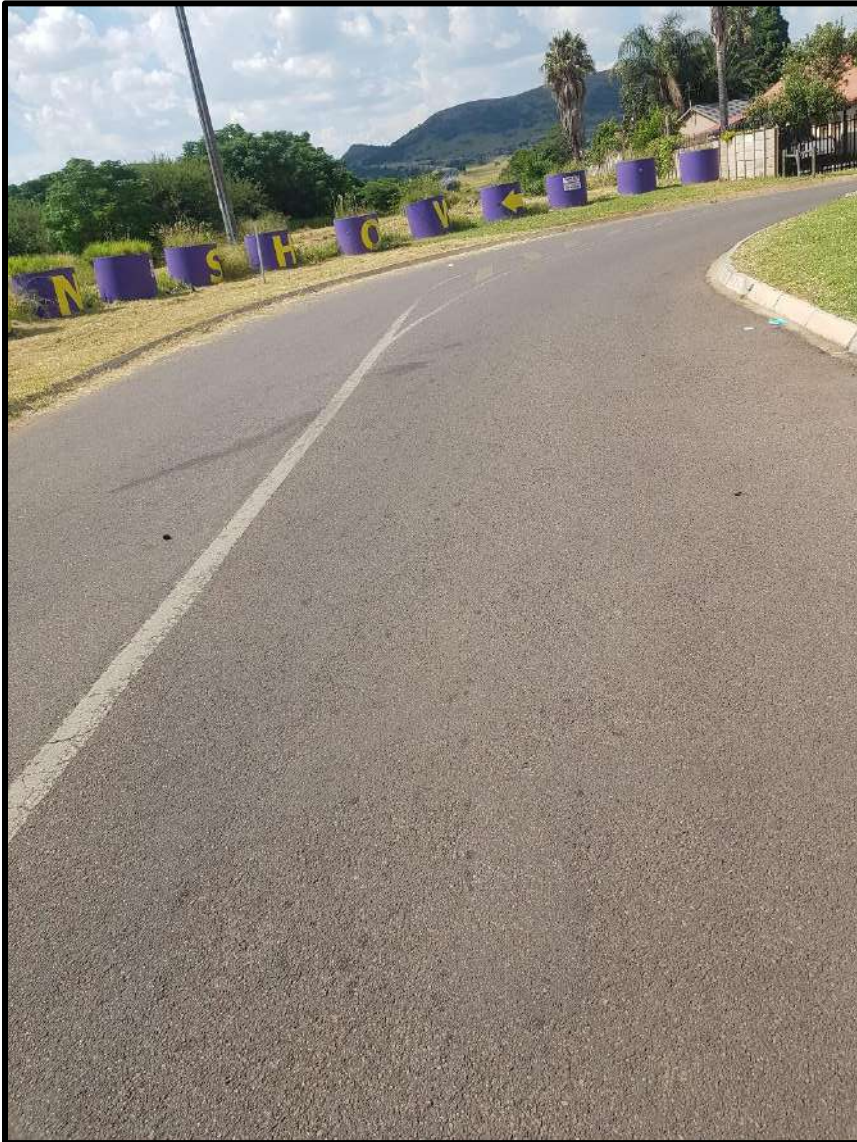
Intersection of Mulder Street and Wilhelm Street.
